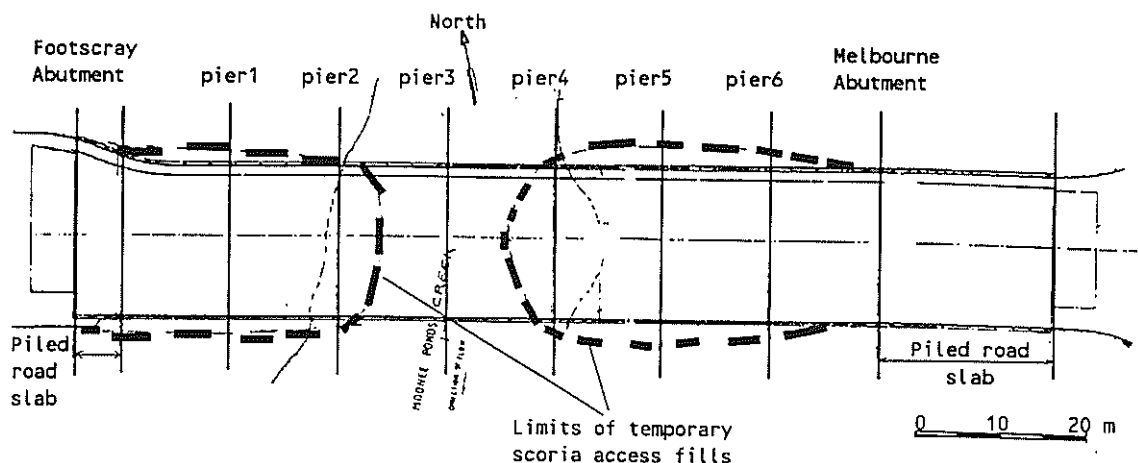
Bridge site plan - Moonee Ponds Creek, Melbourne.
